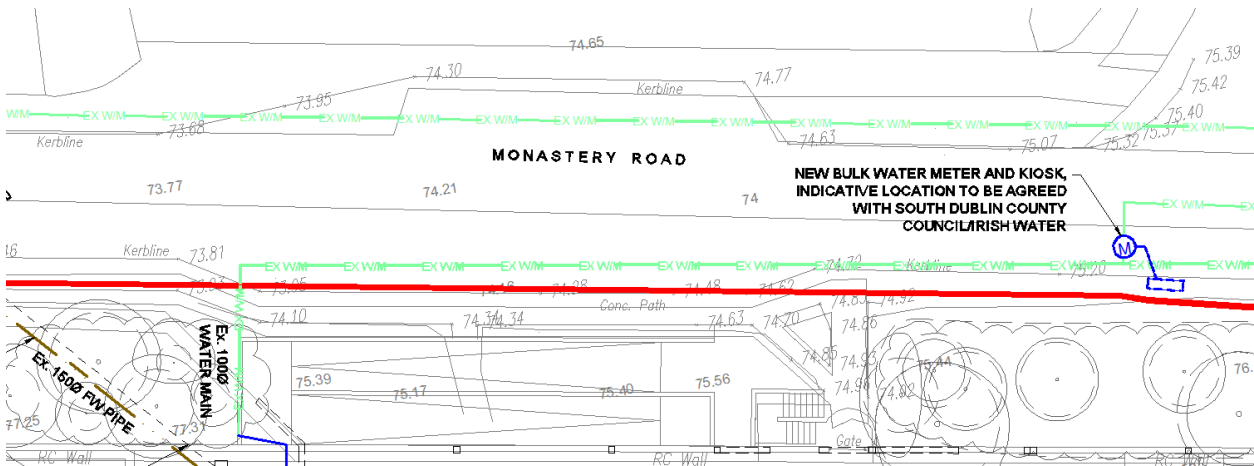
existing site levels approximately 74.500mOD at northern site boundary with footpath on Monastery Road
